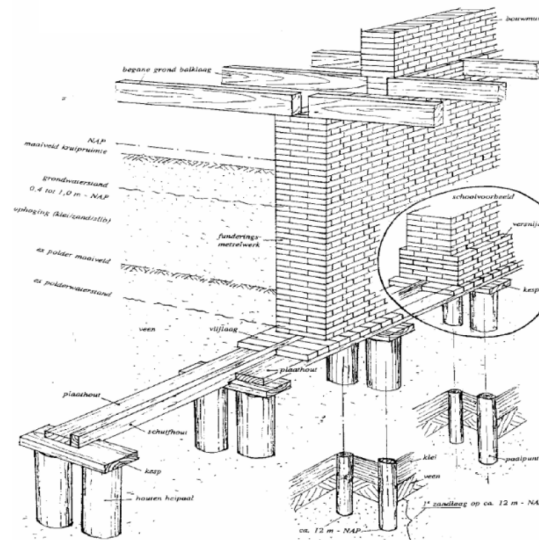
Typical timber piled foundation system in Amsterdam. Reprinted from Zantkuijl, H. J. (1993). *Bouwen in amsterdam - het woonhuis in de stad*. Architectura & Natura.
